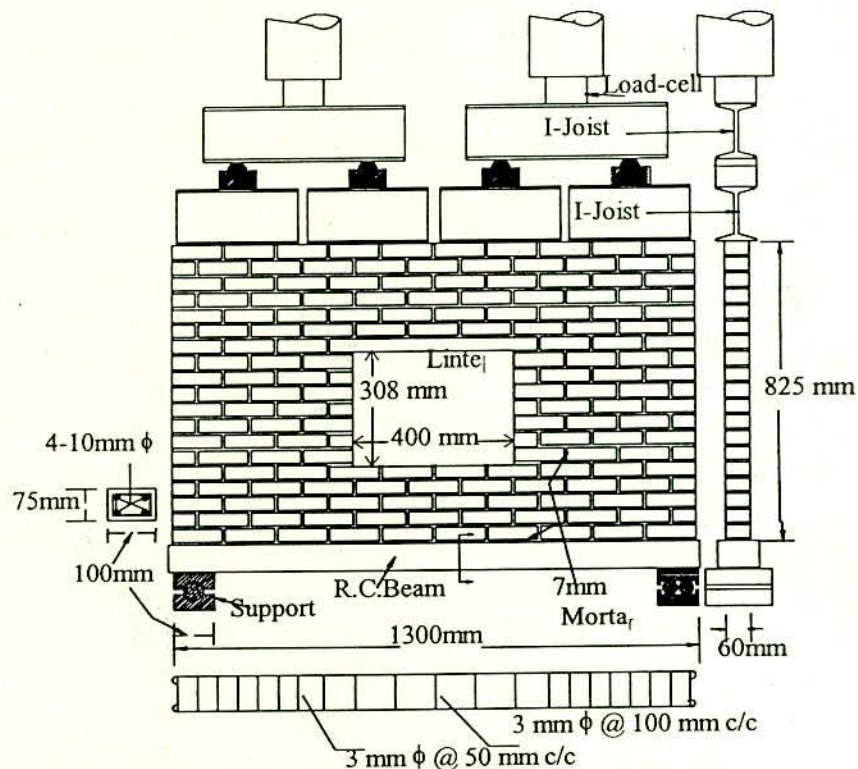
(a) Details of Panel and Testing Arrangement for Wall-beam with Central Opening
